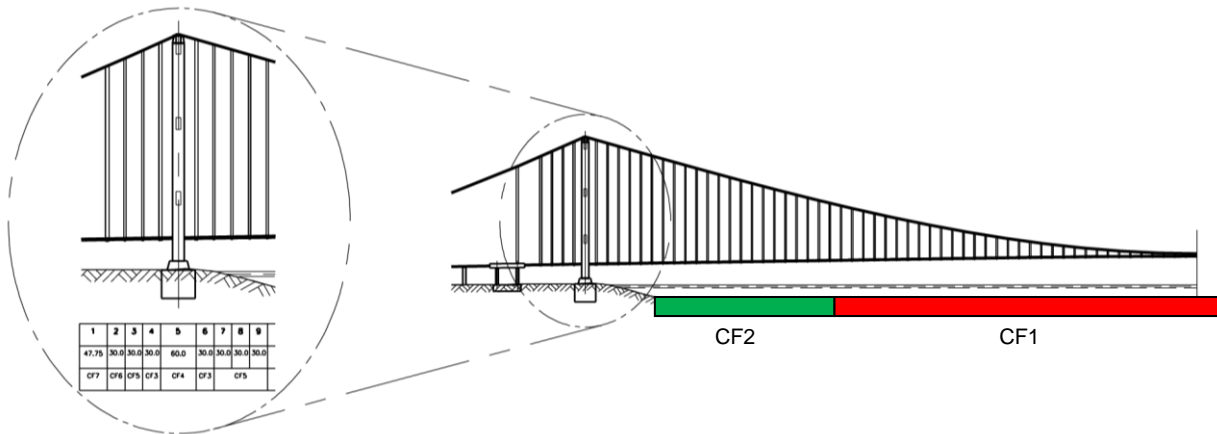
Distribution of the cross sections for the railway girder throughout the bridge
